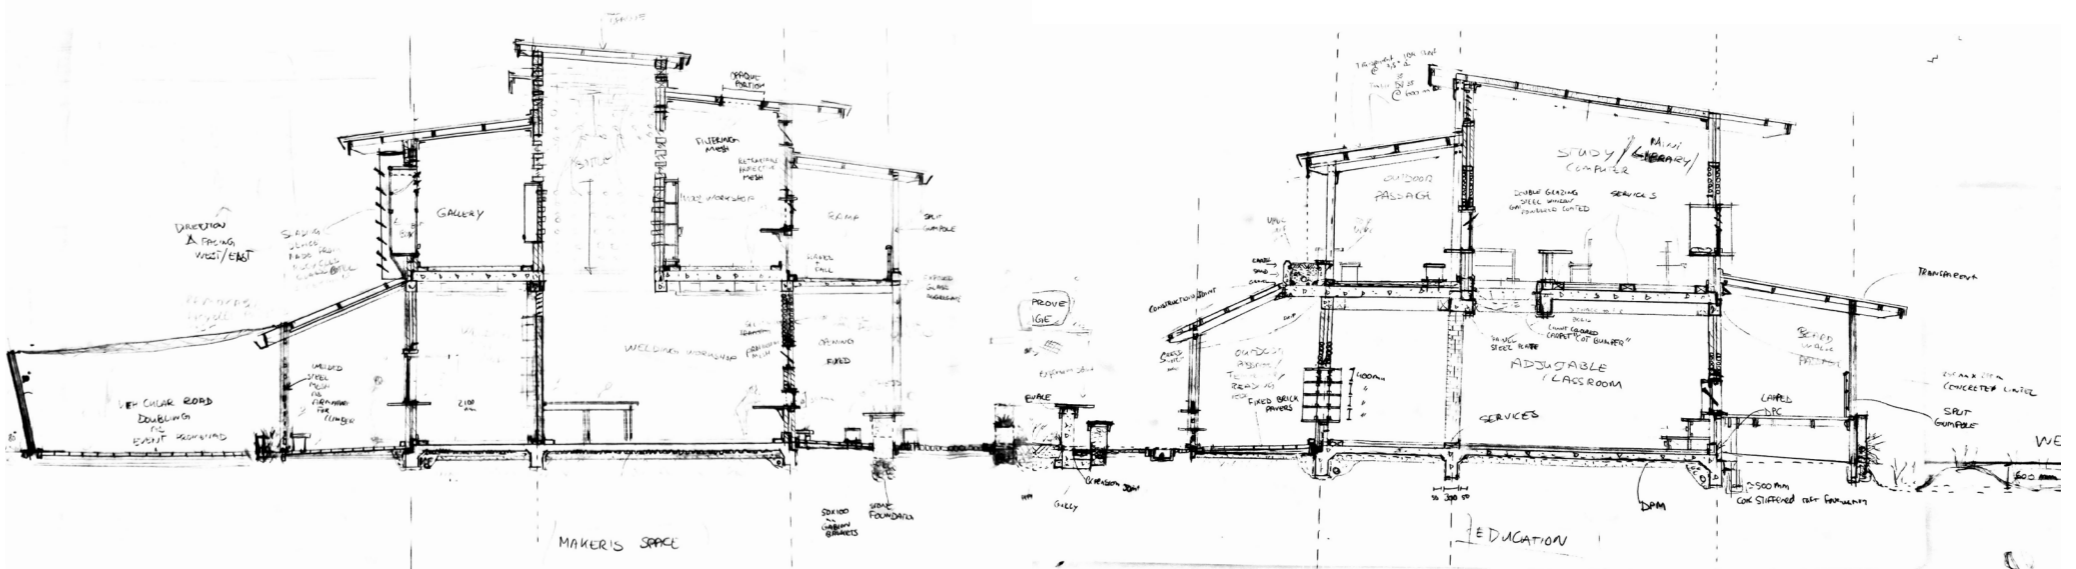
1:50 sketch section through Maker's space and afterschool centre (Author 2021)
